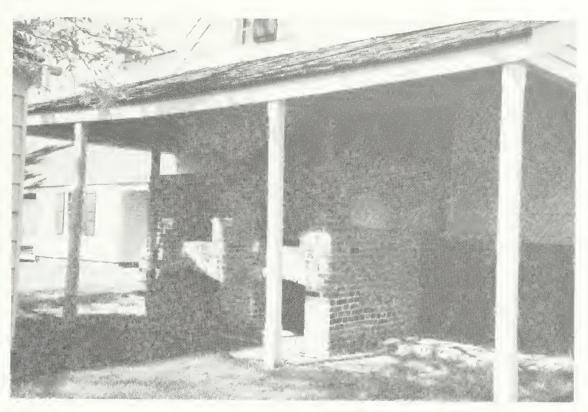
Kitchen wing, east elevation, exterior bake ovens.
